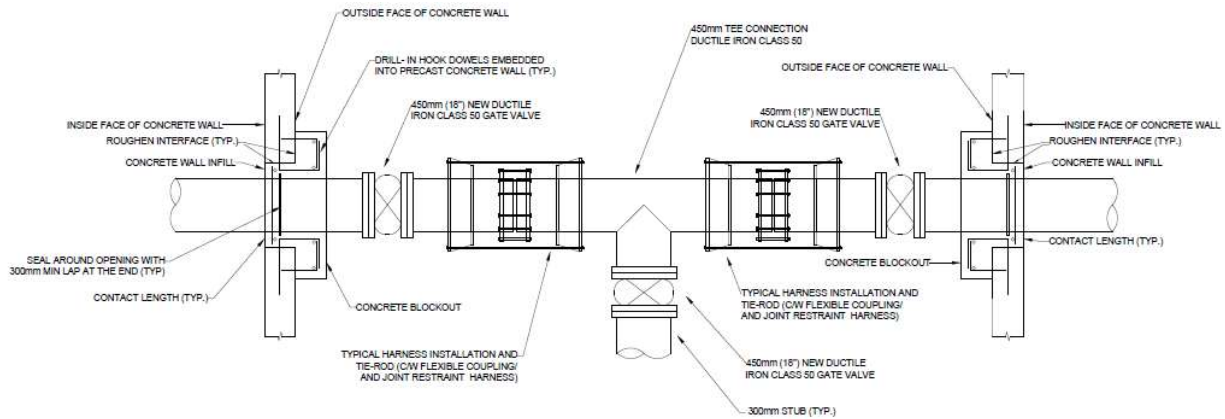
EXCERPT OF DETAILED TANK-TANK CONNECTION DESIGN
